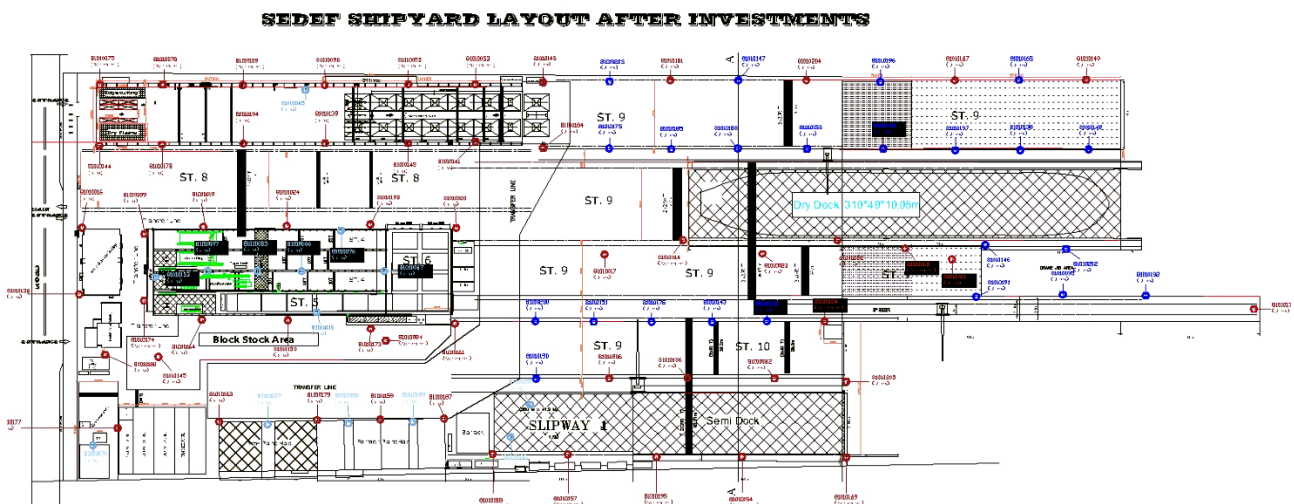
The locations of the indoor (light blue) and outdoor gateways (blue and red).
